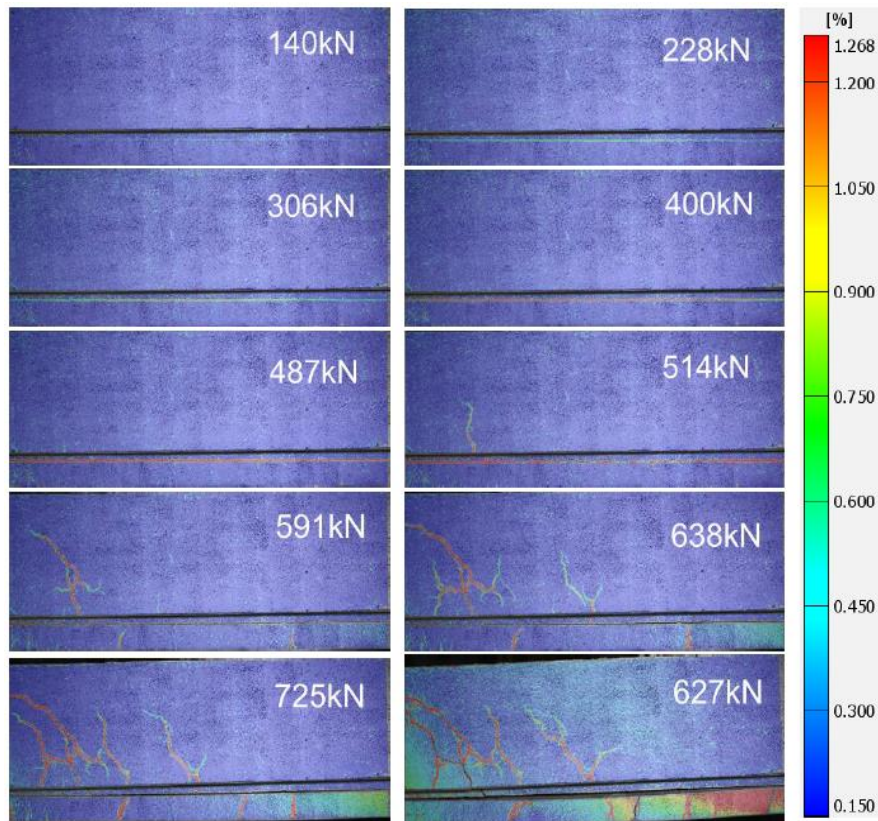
Development of cracks in side surface (Shear test) [60]
